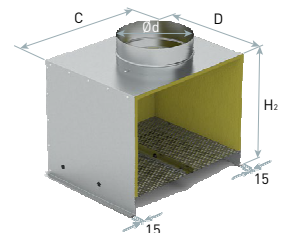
Dimensions of the rectangular box with a top connection pipe.
